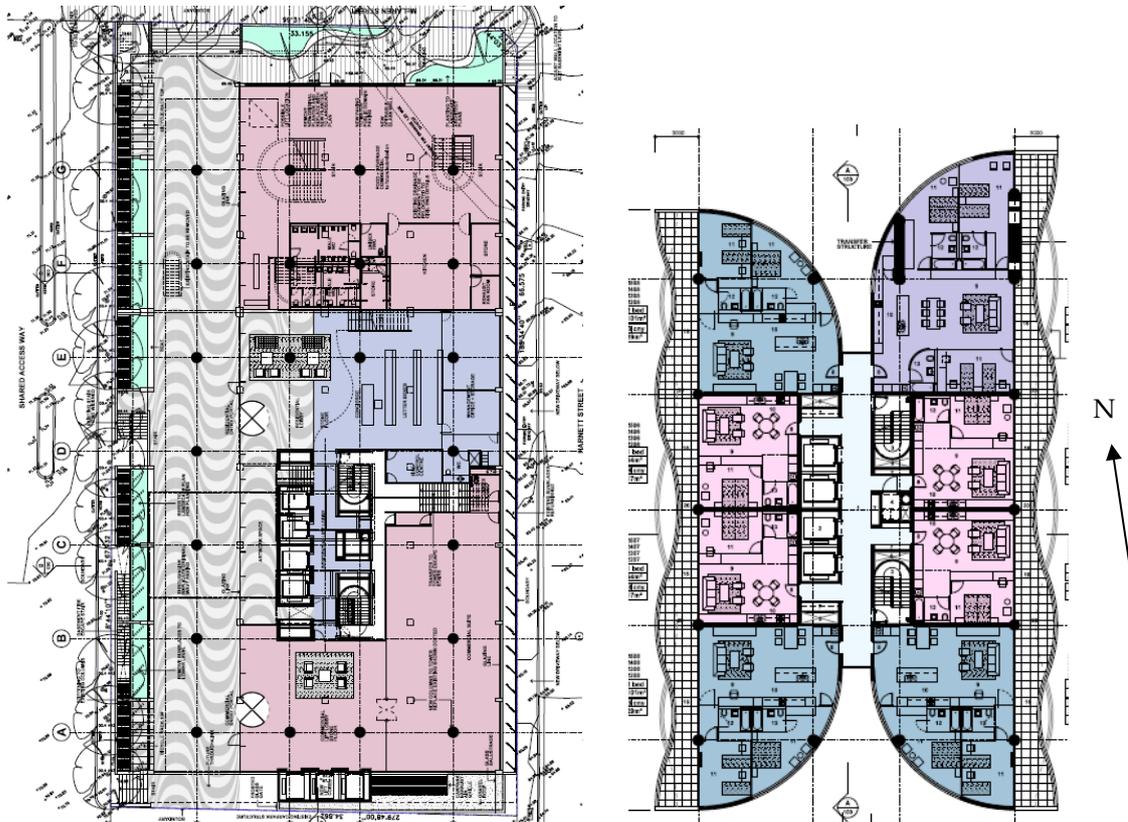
Ground floor plan (L) and typical tower level (R) of the proposed development
